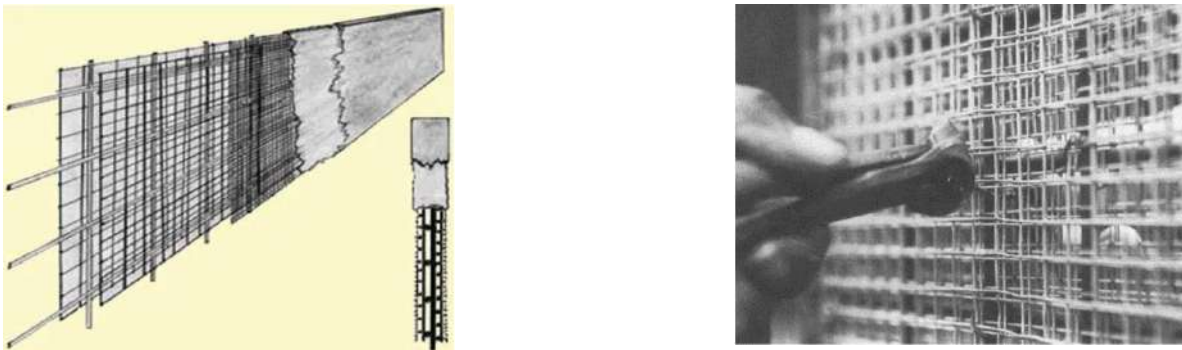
Cross section and reinforcing mesh used in ferro-cementing
